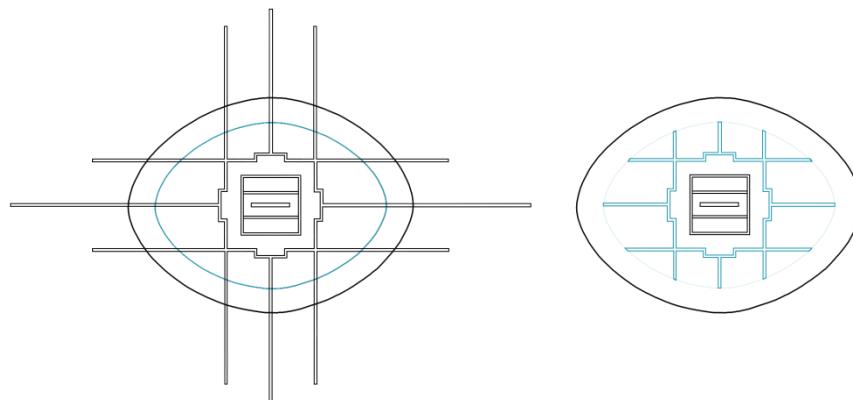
For each floor, the lengths of the walls are adjusted by an intersection between the grid of walls created and an abstract volume corresponding to the interior space of the building.
